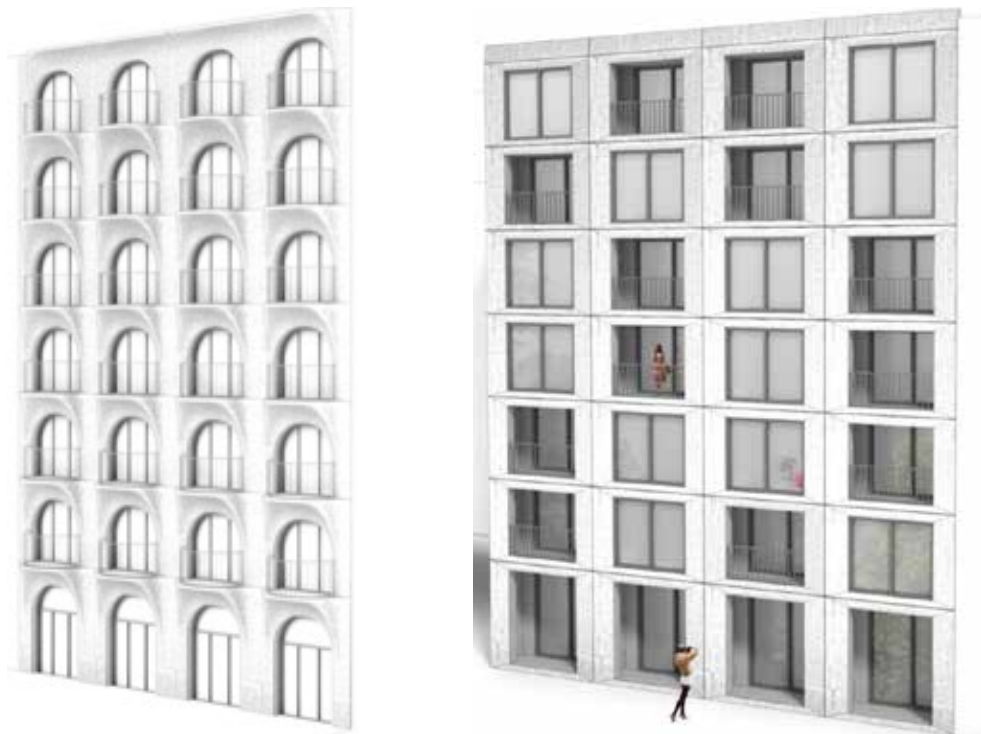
Schematic building designs: Kantstraße 126 and 128 with load-bearing outer ILC walls (Leibinger et al. 2016)
